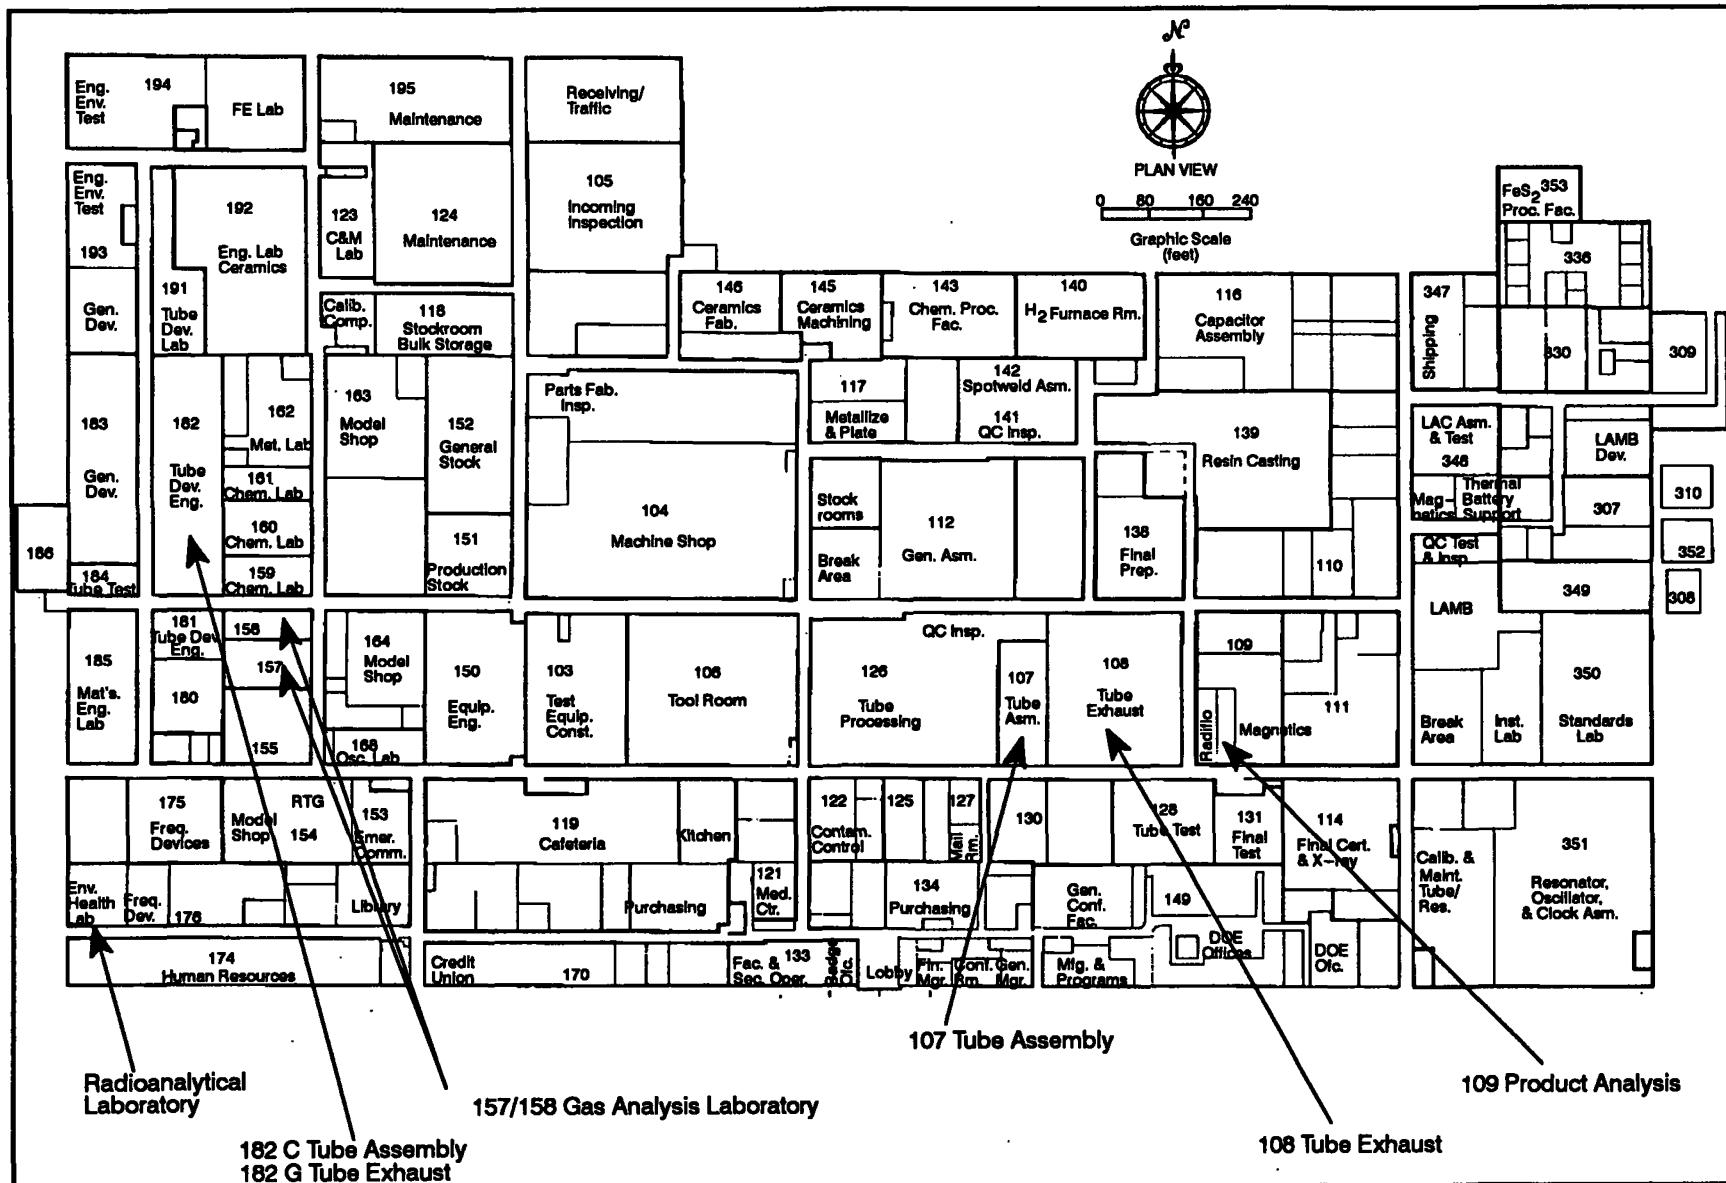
Pinellas Plant RMAs in Existing First Floor Layout
